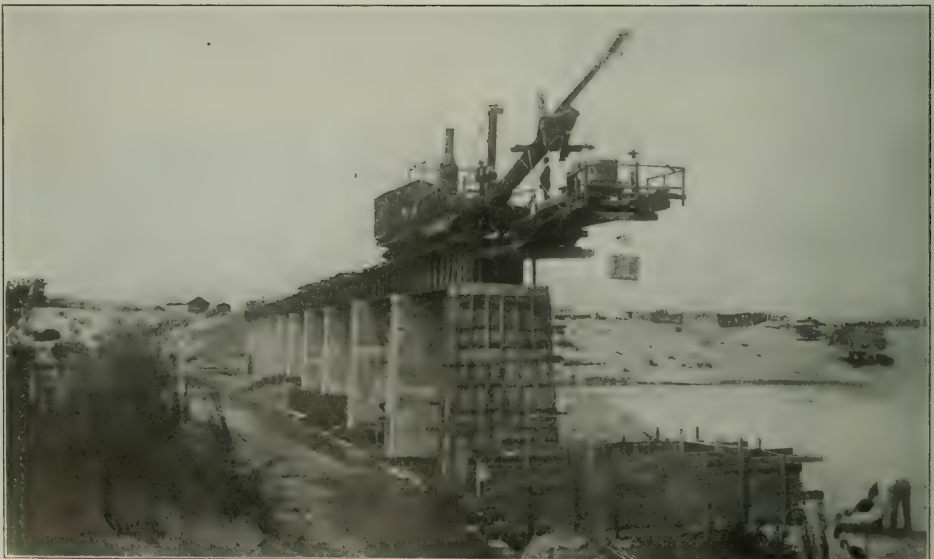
Conchos River Bridge; Method of Depositing Concrete in Bases.
